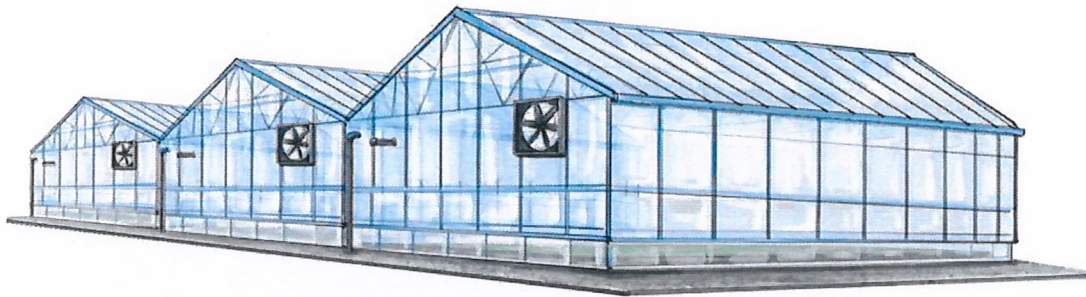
Typical Agrihood Greenhouse Concepts
